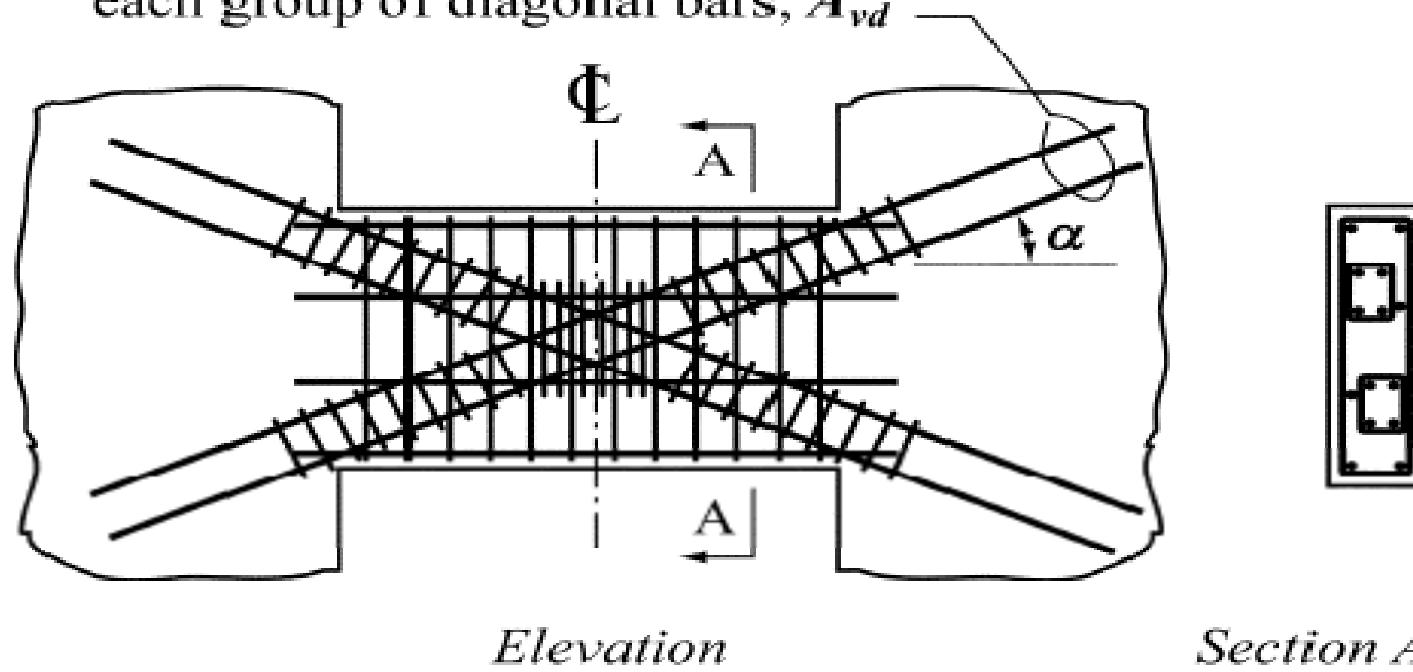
Coupling beam with diagonally oriented reinforcement
